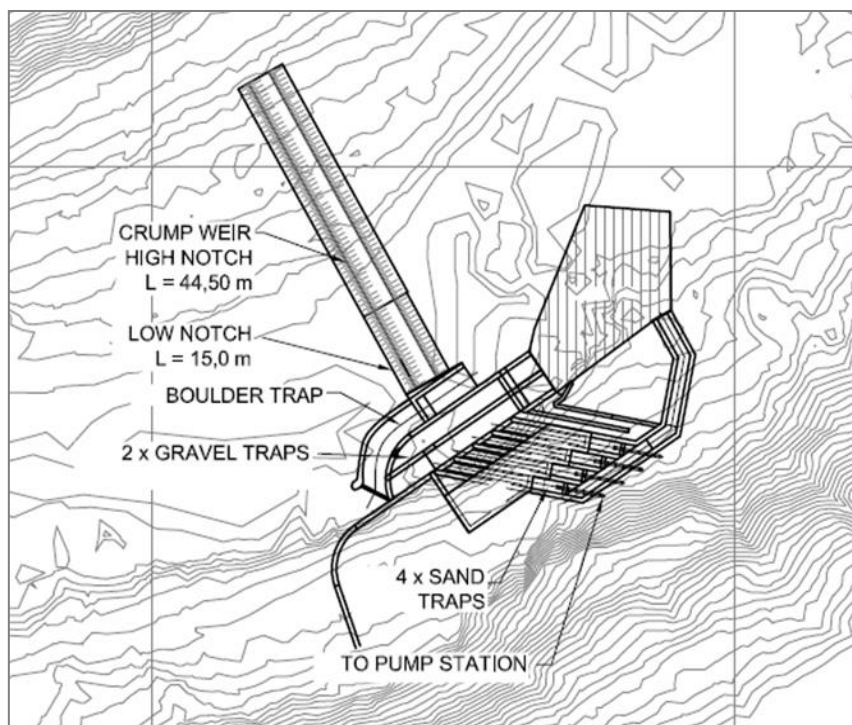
Ngwadini Abstraction Works Layout to be used for Goodenough Abstraction Works
